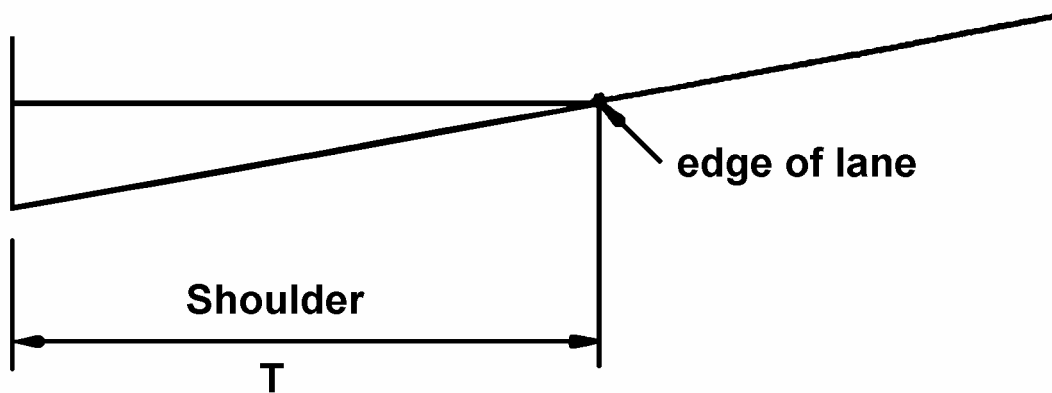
Maximum Gutter Storage Capacity
